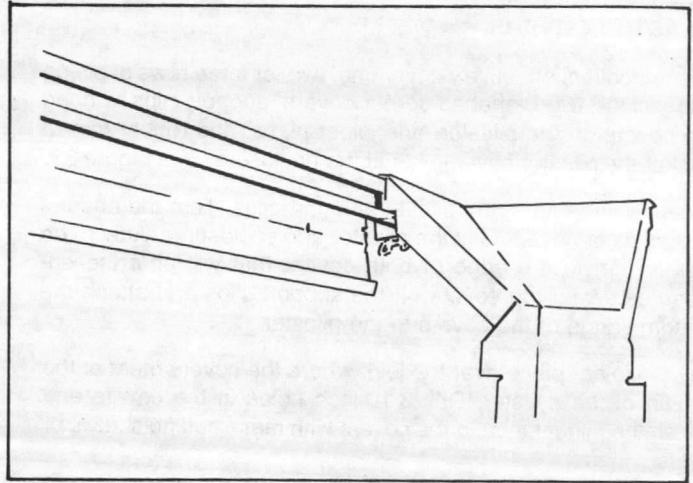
Inside Corner, Mounting Strip, and Locking Clamp (Front View)
